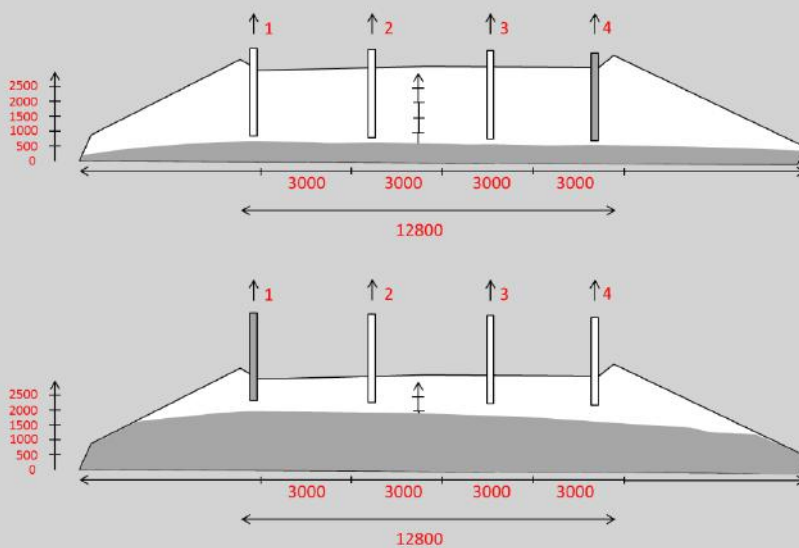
The casting procedure applied for the underpass bridge walls.
